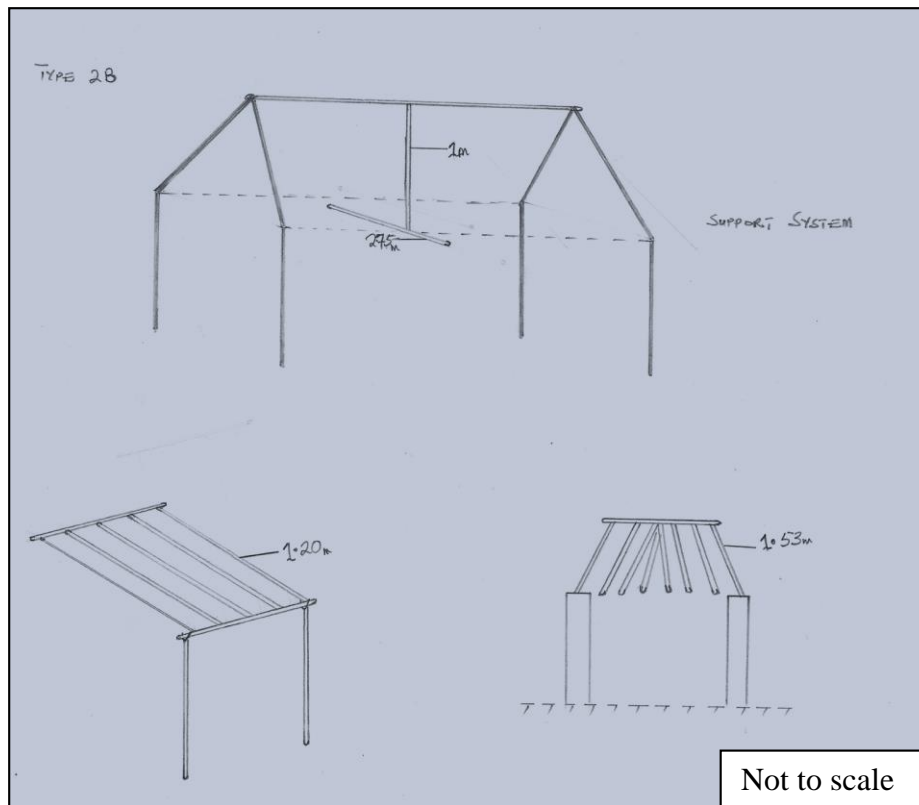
Type 2B- Triangular Roofing Style with a central support system
